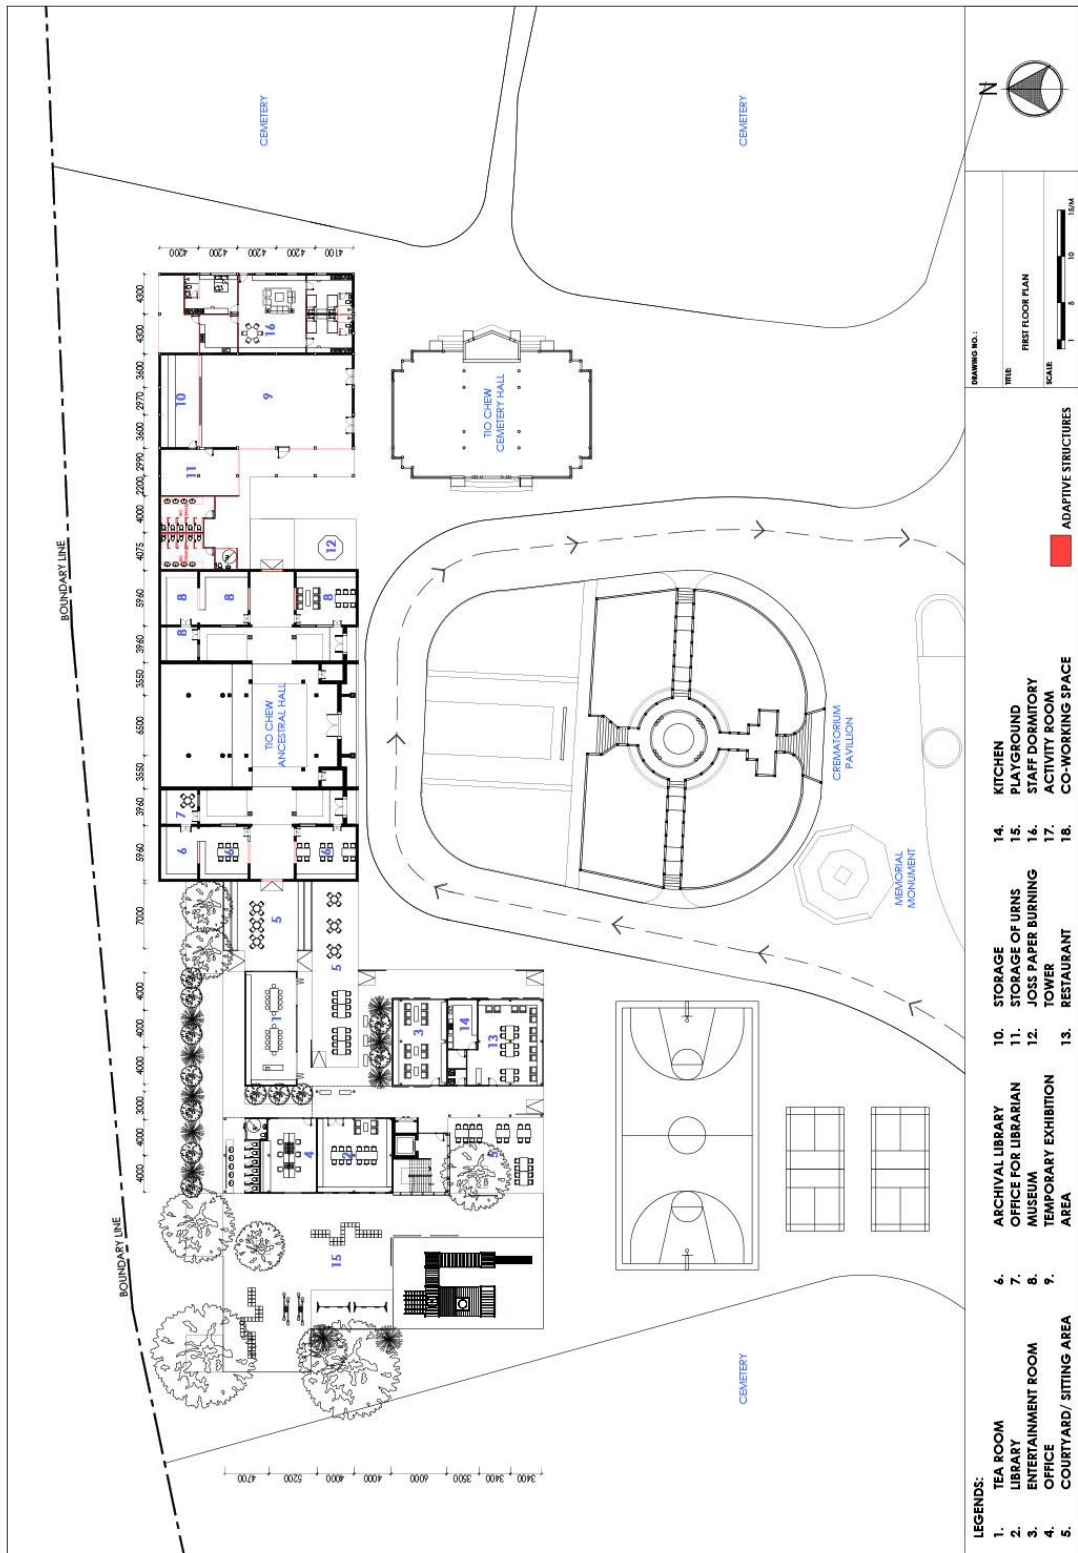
22 First floor plan indicating the new addition and adaptive reuse.
